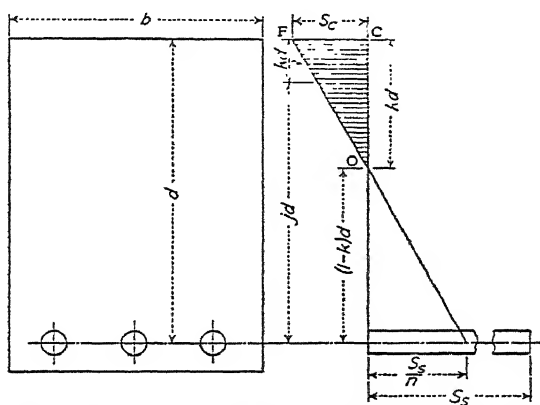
Stress in rectangular reinforced-concrete beam.
